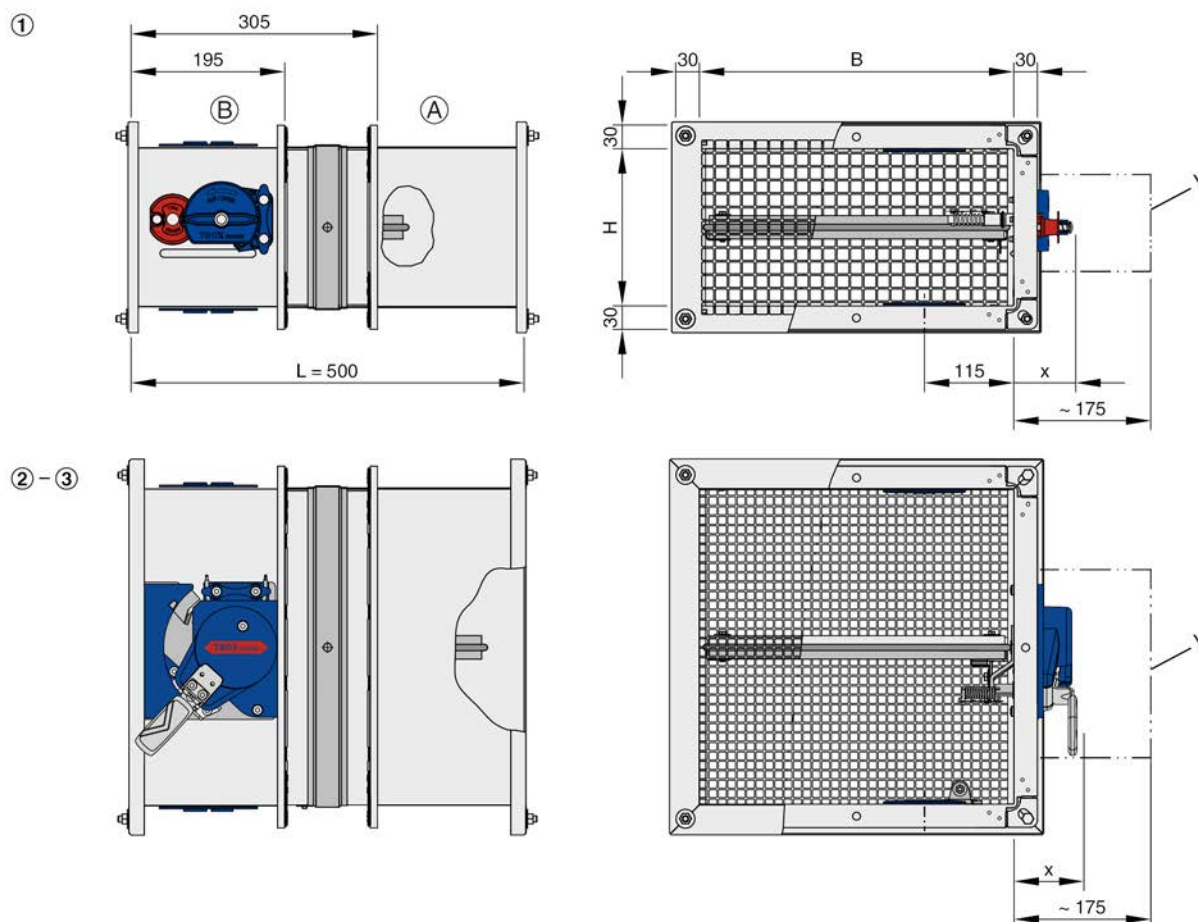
FKA2-EU with fusible link and cover grille used as an air transfer unit
